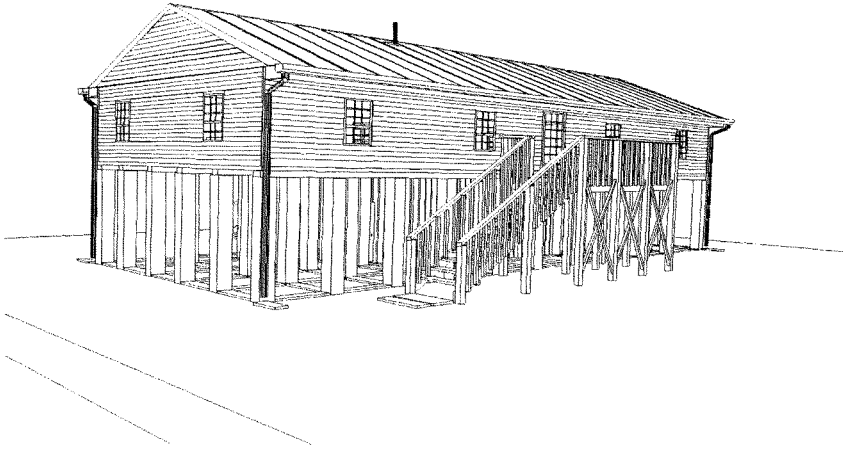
and 45 – Floodproofing Design Segmented Block – Structure Retrofit
